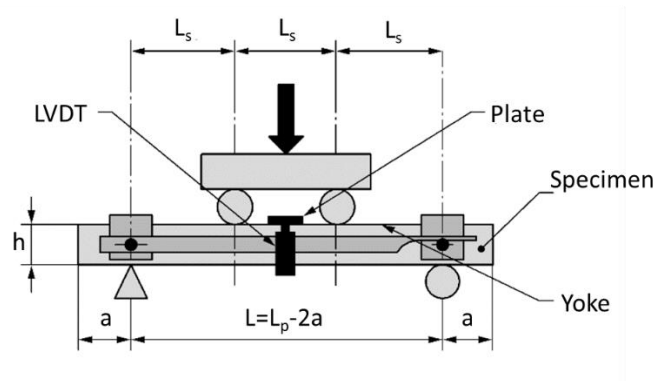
17: Schematic test setup of FPBT plate specimen (adapted from NF P18-470, 2016)
